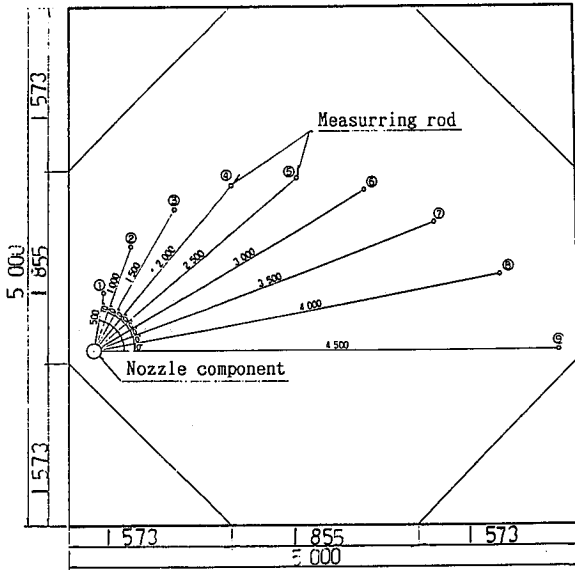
Plan View of Octagonal Soil Well with Measuring Point
